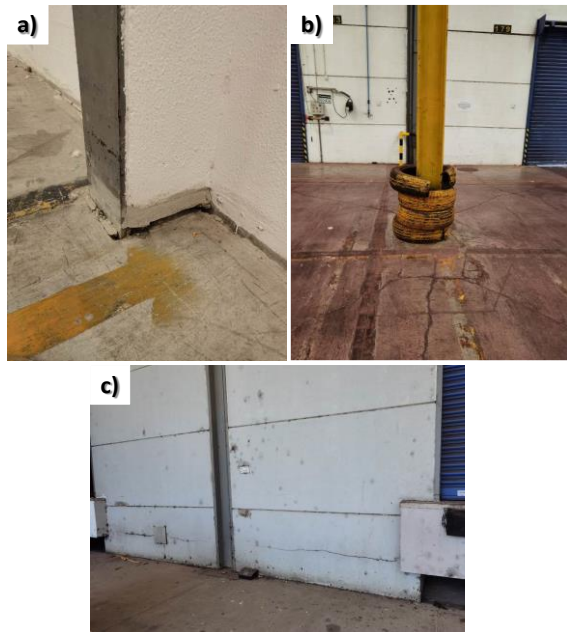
Main pathologies. a) differential settlements between the pavement and the facade, b) degradation of the pavement around a pile cap, c) cracking in the east side of the warehouse.
